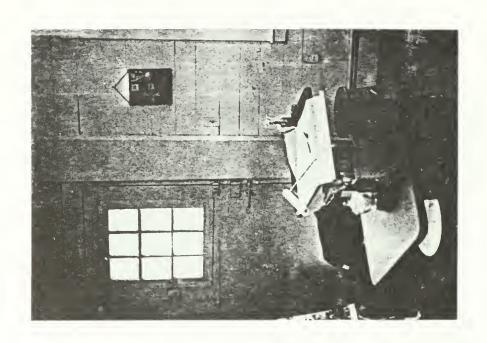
West India Goods Store, interior of first story, east wall, showing doorway and boxed post between bays E and D.
